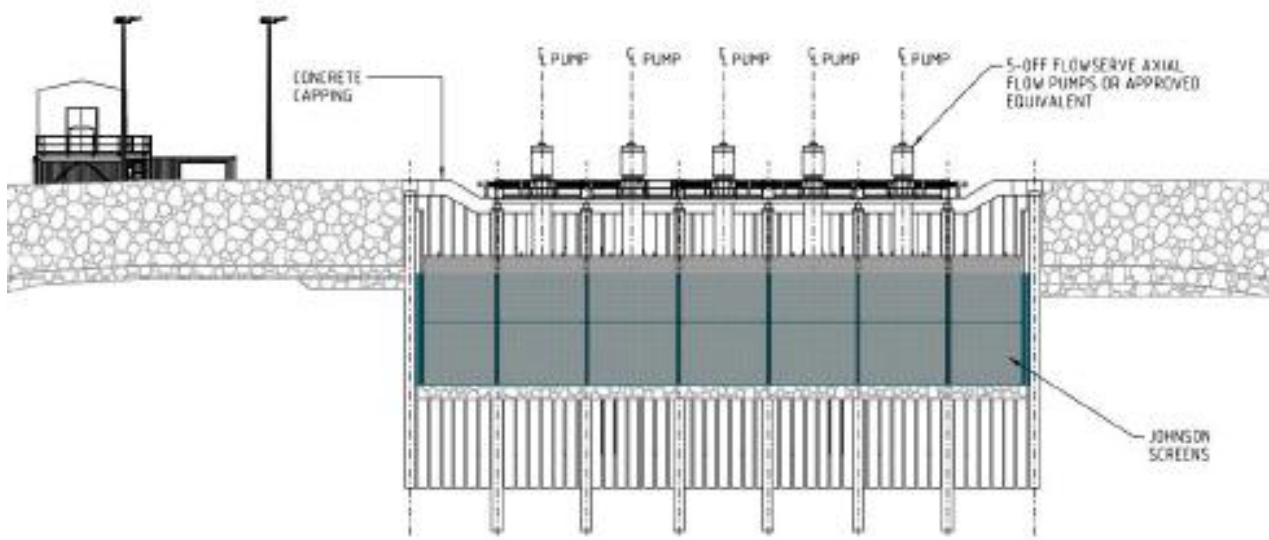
Sea Water Intake, Pump Station (PS-01) and Intake Channel – Plan Arrangement
